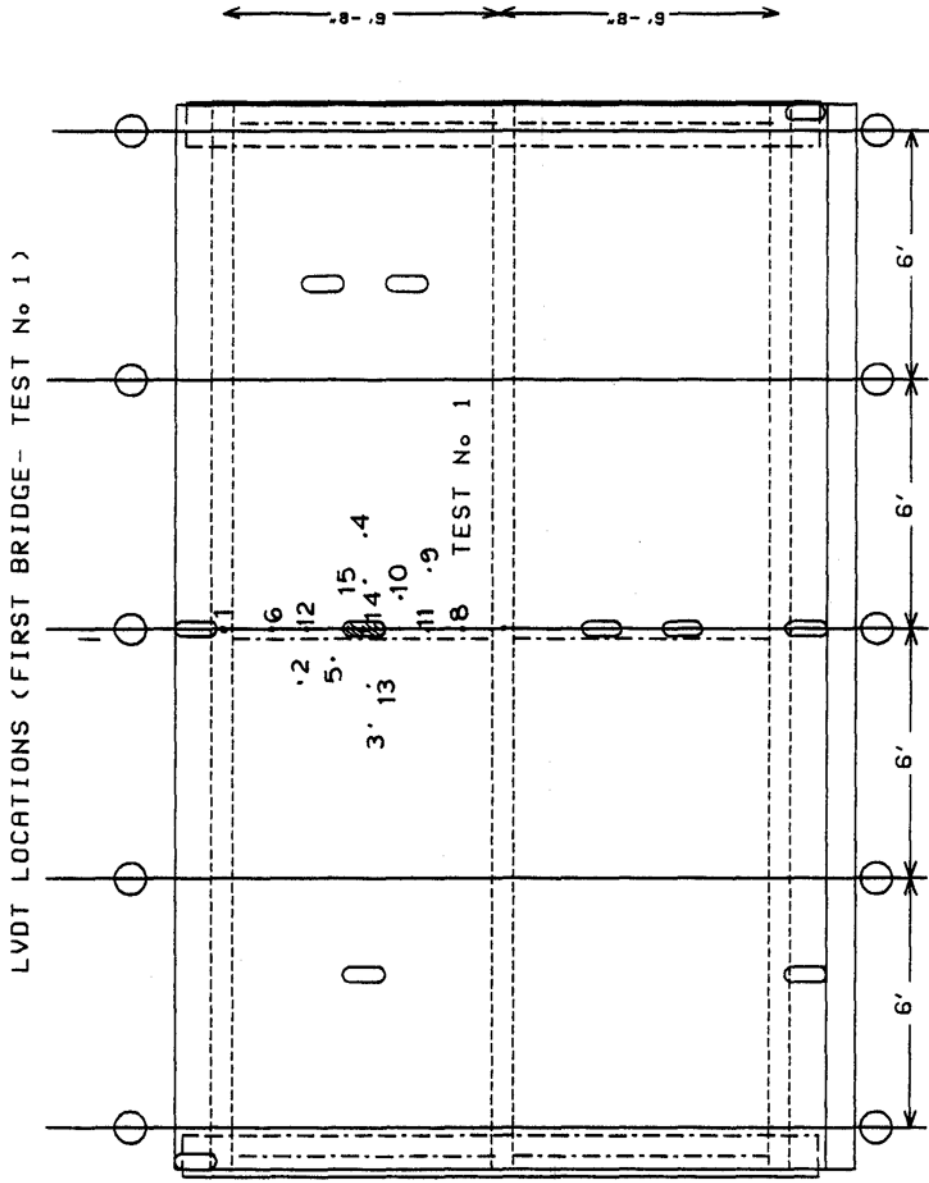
LVDT Locations (First Bridge - Test No. 1)
